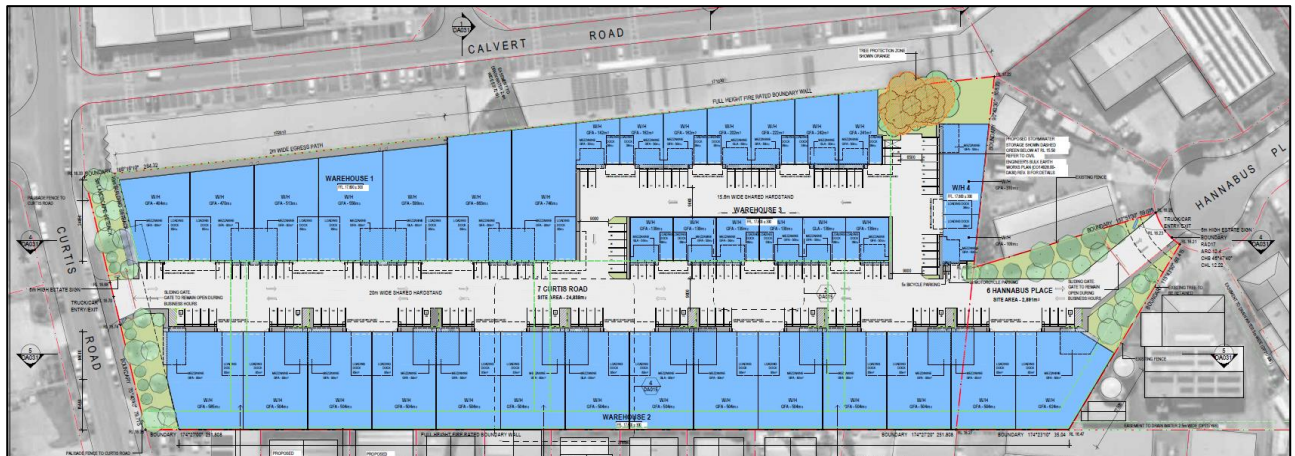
Proposed Site Plan and Ground Floor Plan (Issue P1 dated 13 December 2024)
